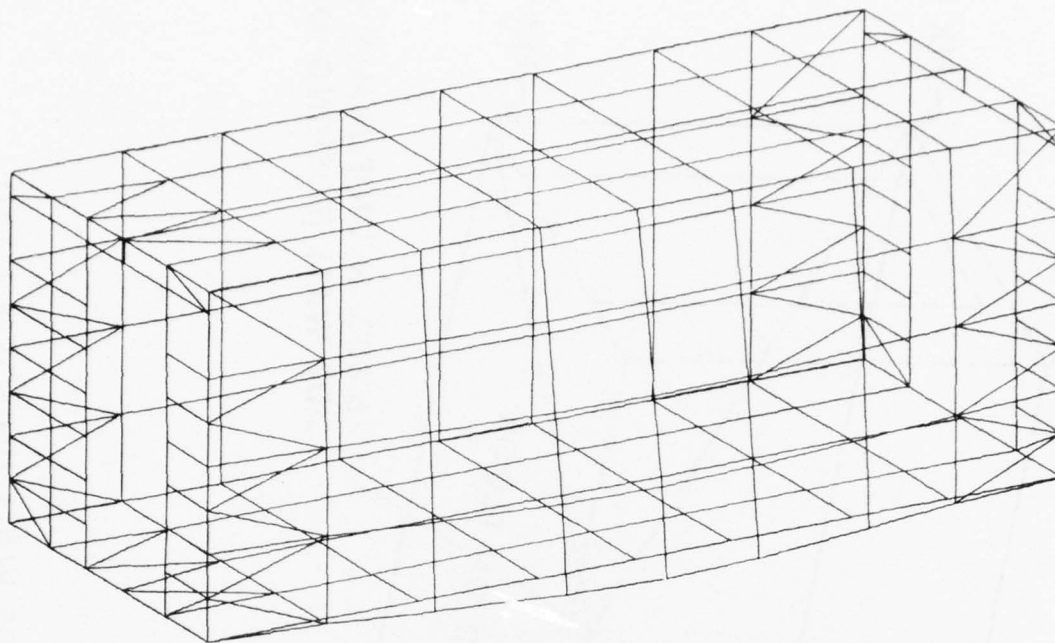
UNIFORM LOAD ON END WALL. SUPERIMPOSED PLOT FOR UNDEFORMED AND DEFORMED END WALL.
